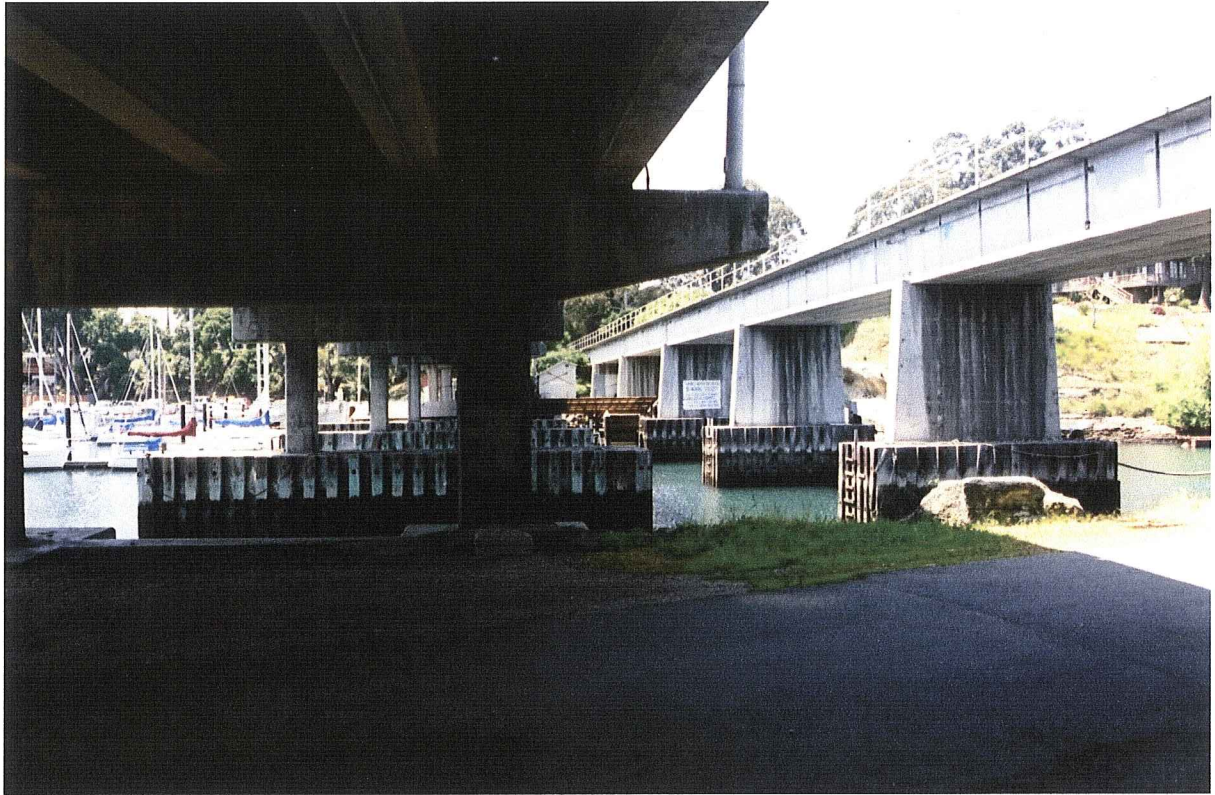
a. Murray Street Bridge and Railroad Bridge side by side, taken from the east end.
